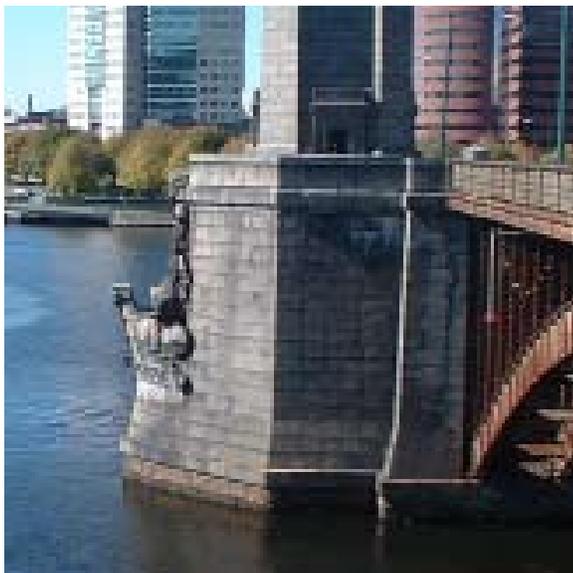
Bridge Pier (below bridge deck) and Tower (above bridge deck)
